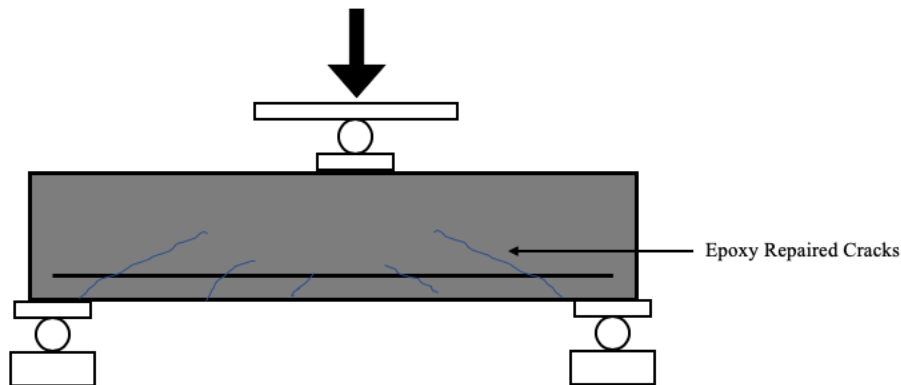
Epoxy-repaired Reinforced Beam Three Point Bend Test
